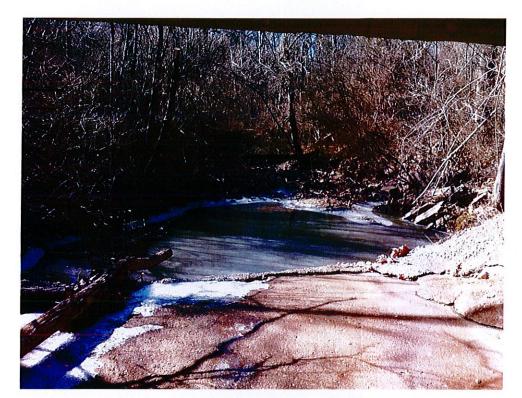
PHOTO E: VIEW DOWNSTREAM - INVERT TOO HIGH
